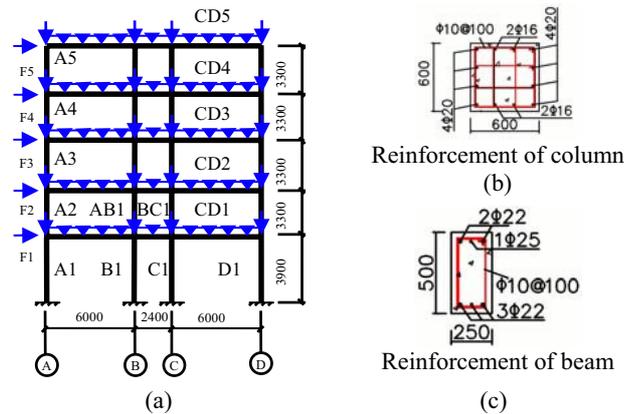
Elevation and details of 5-storey and 3-bay RC frame
